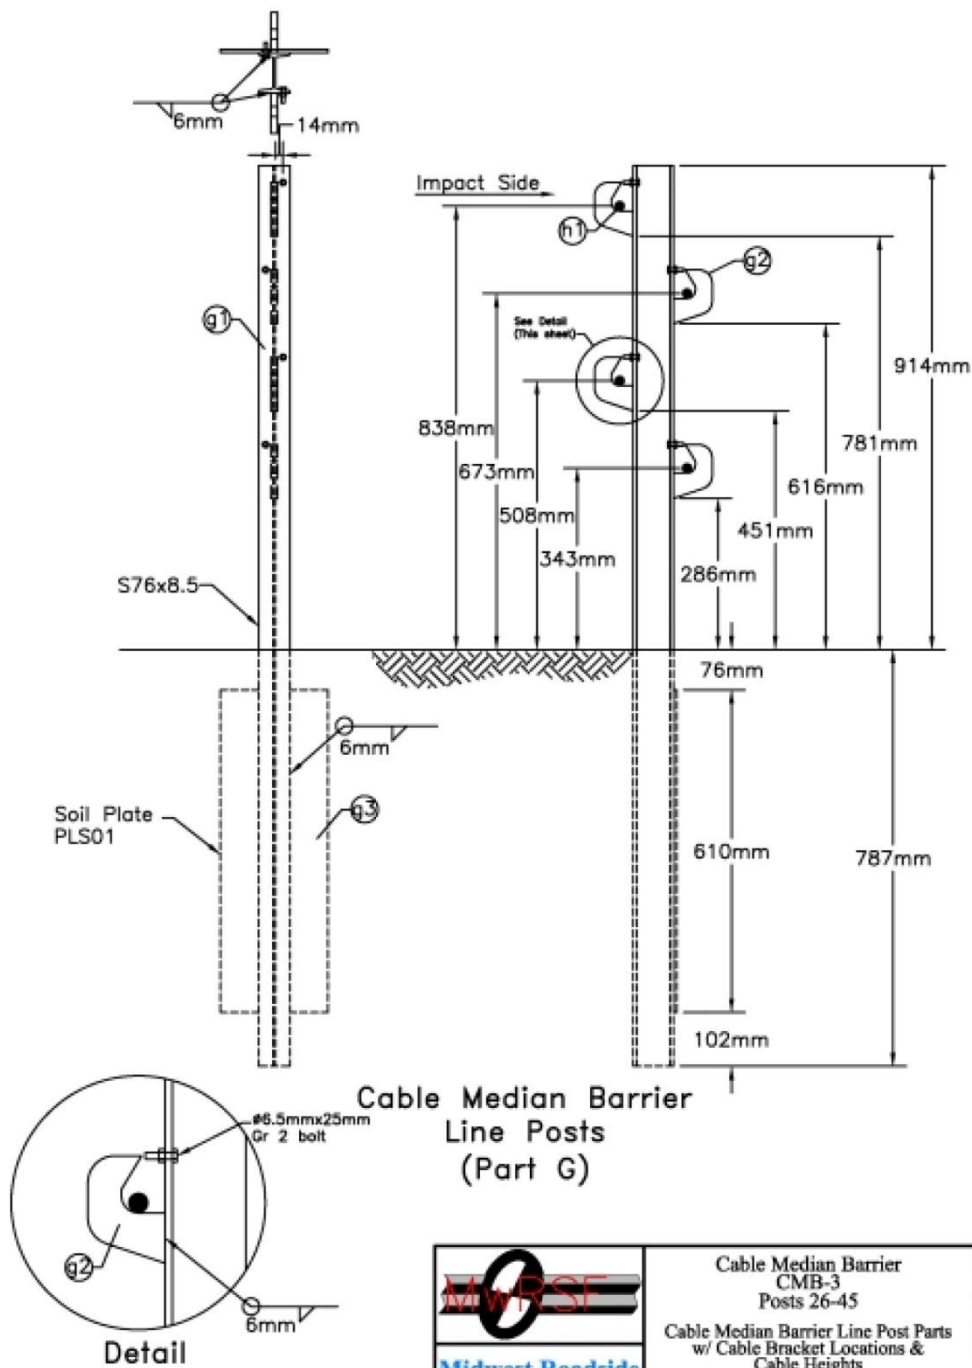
Low Tension Cable Median Barrier System Details, 2000-2008 [64]
